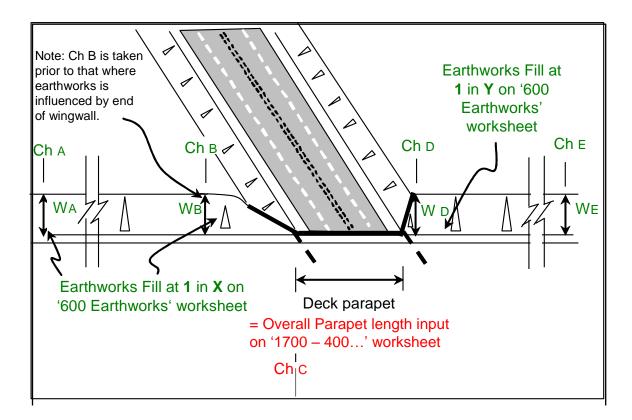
(b) Parapet and Earthworks Inputs at Underbridge with Splayed Wingwalls
